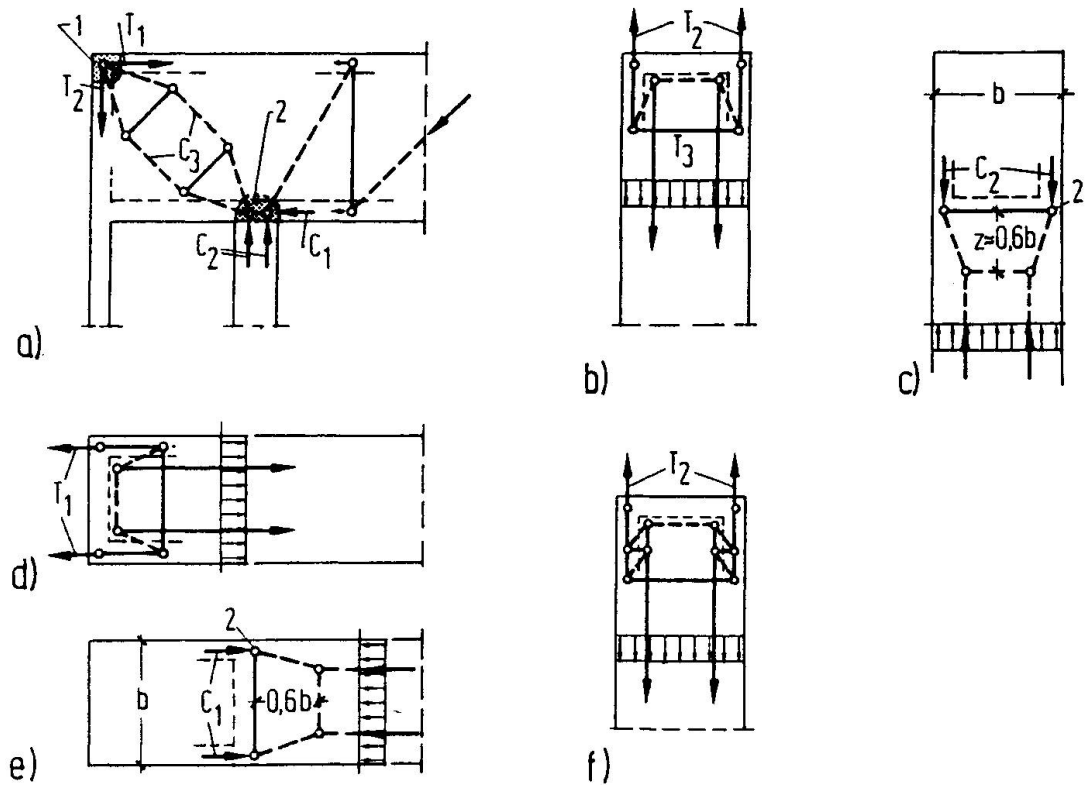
Strut-and-tie models for the structure without internal diaphragm wall. a) Web; b) tensile wall; c) compression wall; d) top flange; e) bottom flange. f) Refined model for the lap problem characterized in Figs. b and d
